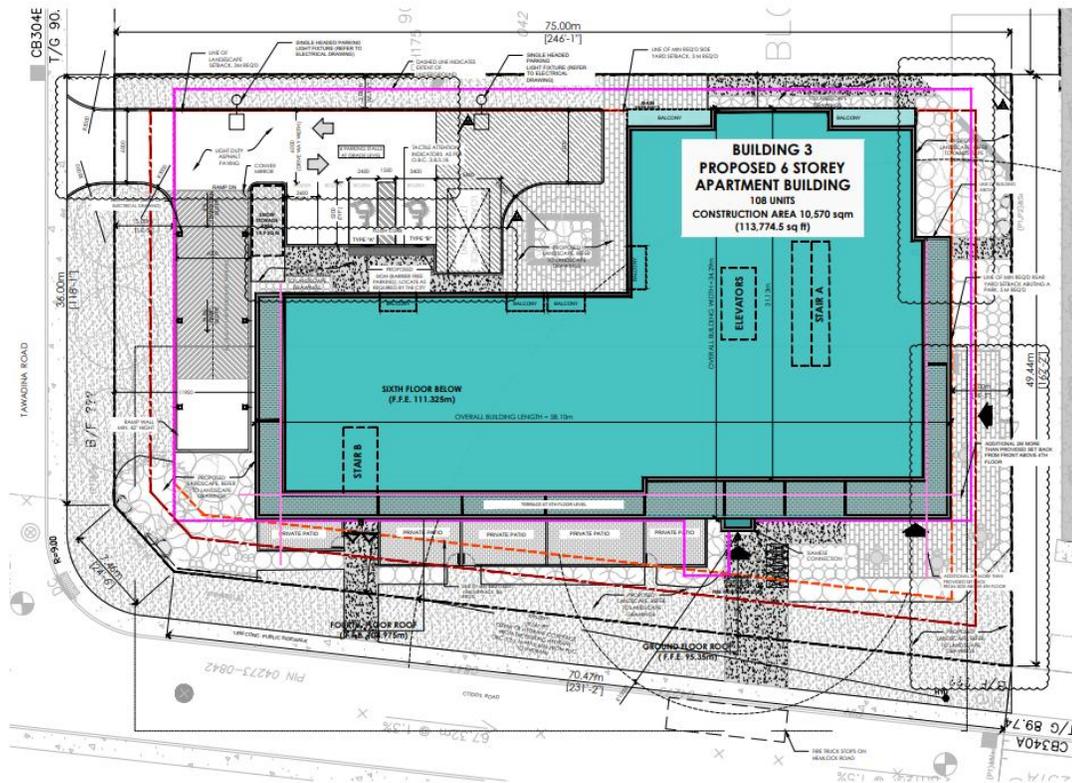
Building 3 (375 Codd’s Road) Site Plan
